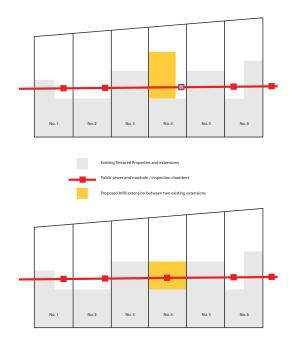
Detail (c) Existing Access Points – Requirement to be 500mm from the new building
